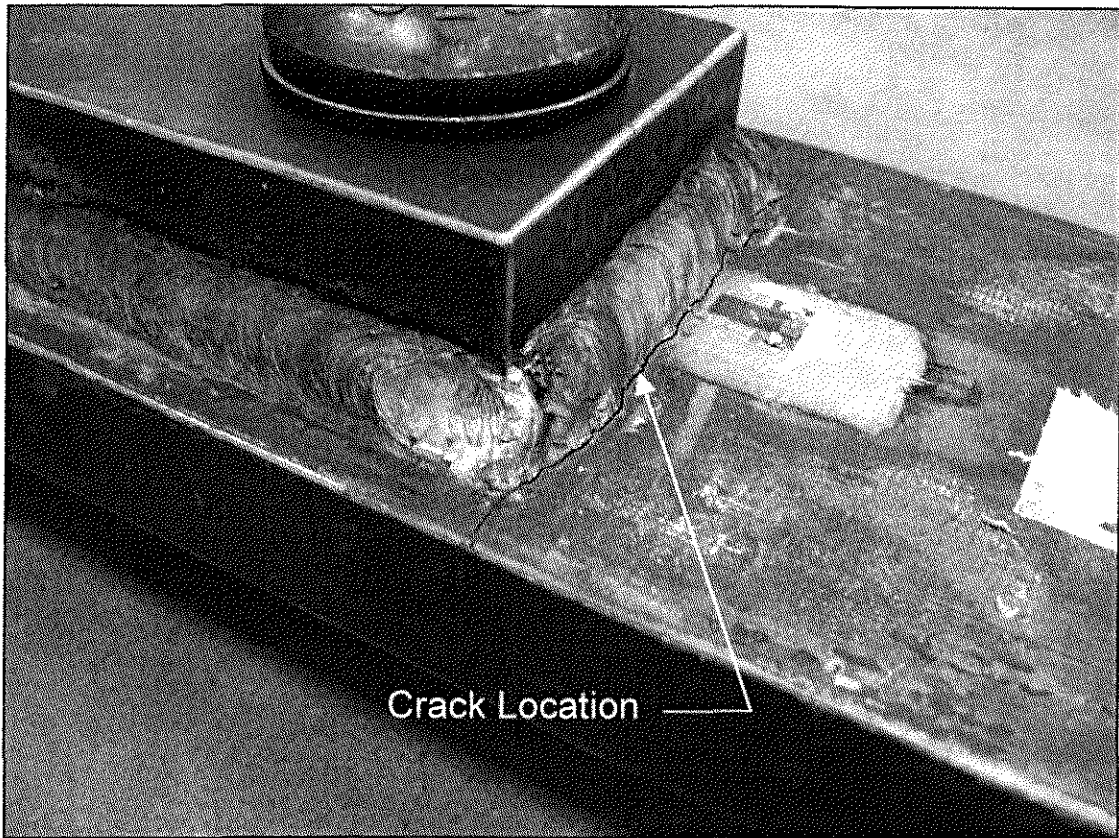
Weld toe crack in a bolted specimen.
